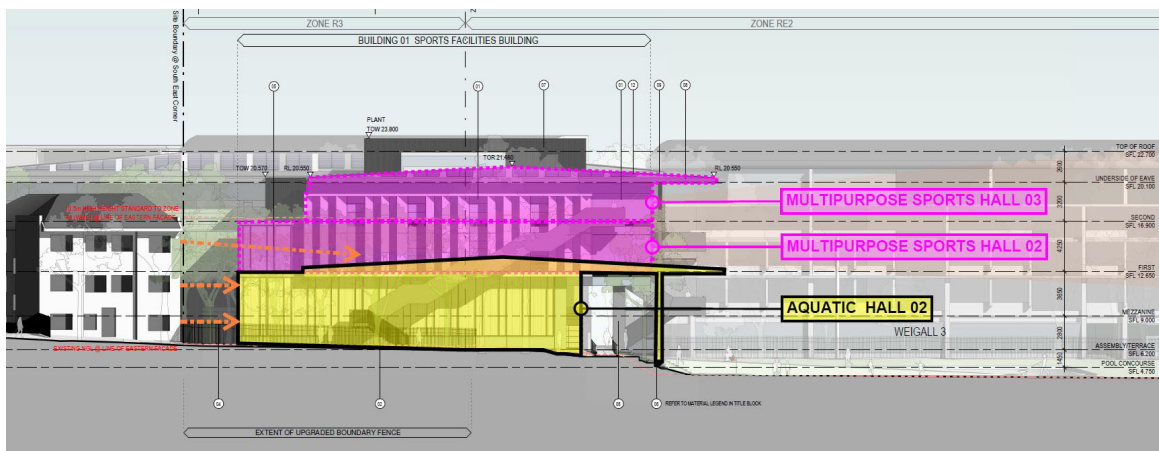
Design amendment required by draft condition B1(b) showing the view/outlook for units at 8 Vialoux Avenue (Source: AJ+C)
